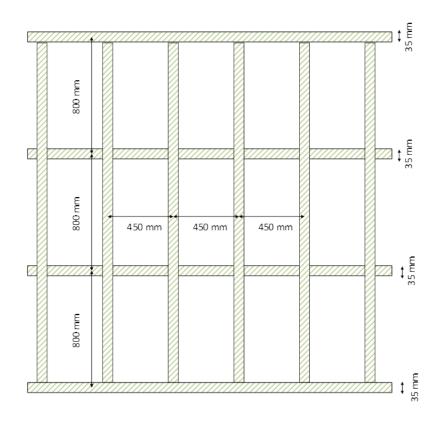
LIGHT WEIGHT DIRECT FIX EXTERNAL WALL ELEVATION PROFILE (TIMBER FRAME)
